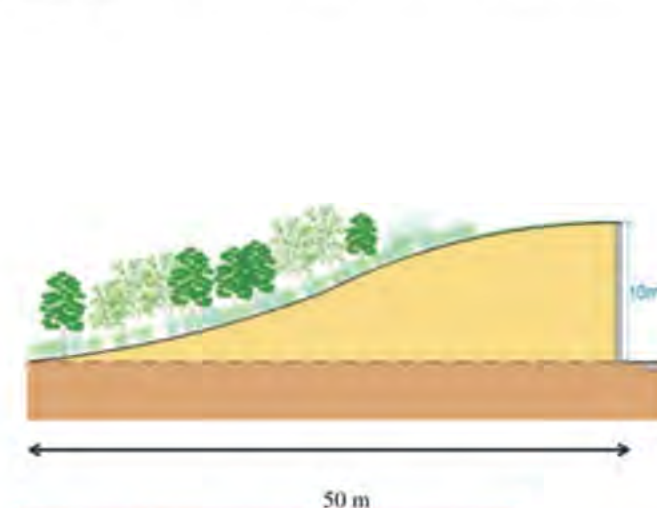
2: Proposed Noise Bund Cross-section
